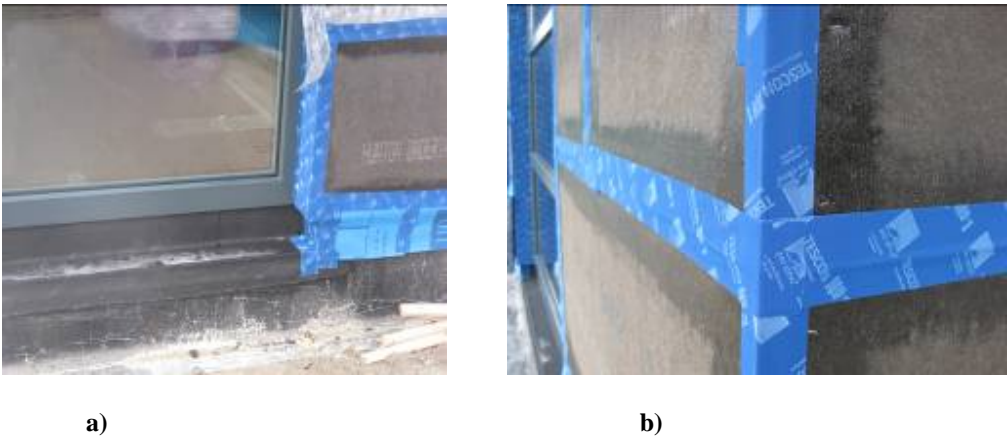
(a) Wind barrier sealed to foundation and window (b) sealed connection between adjacent walls and sealed tongue and groove joint.
